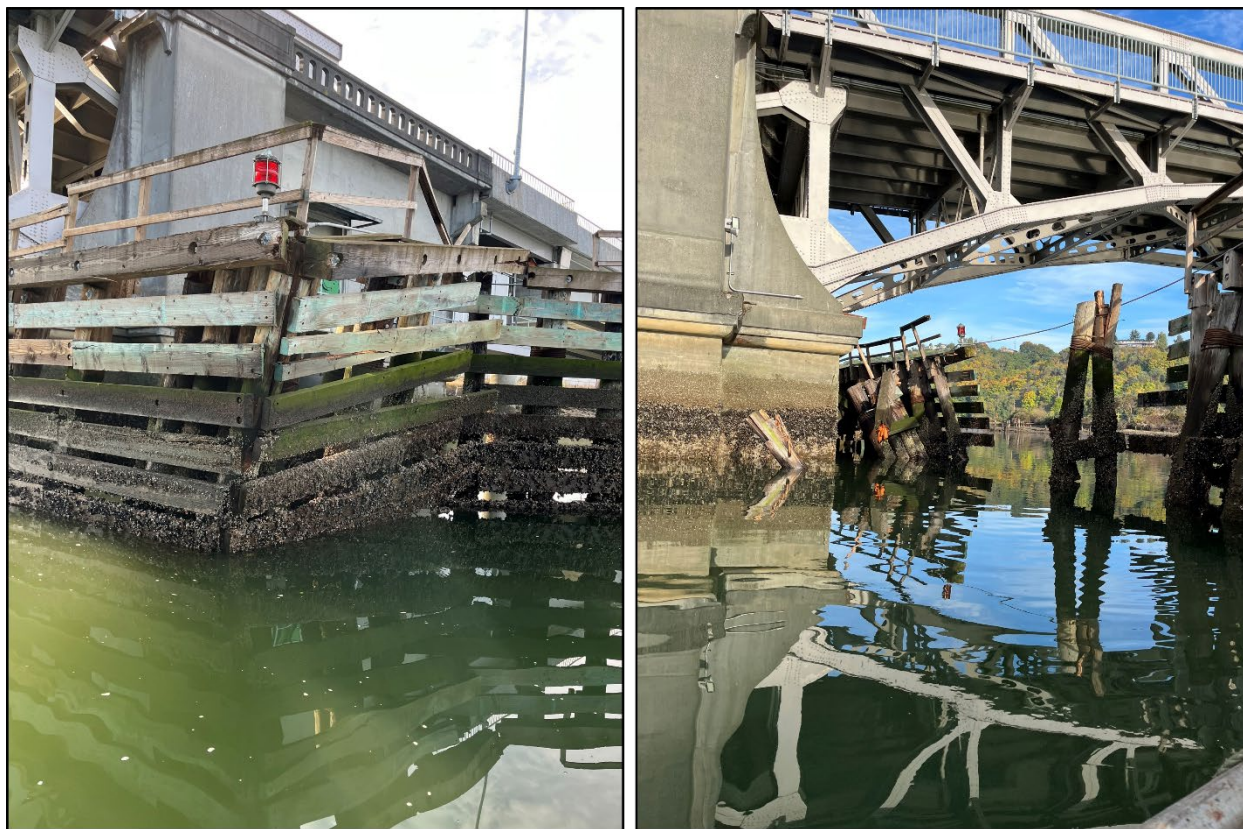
Damage to Hylebos Bridge fender system. *Left to right:* displaced center section and damaged dolphin; broken and missing timber facing boards on eastern and center sections. (Source: Coast Guard)
